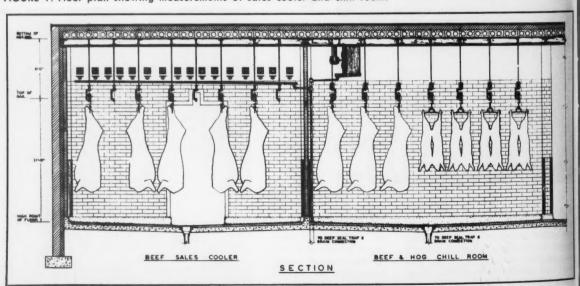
Cross-sectional view of beef sales cooler and hog and beef chill room gives principal measurements.
